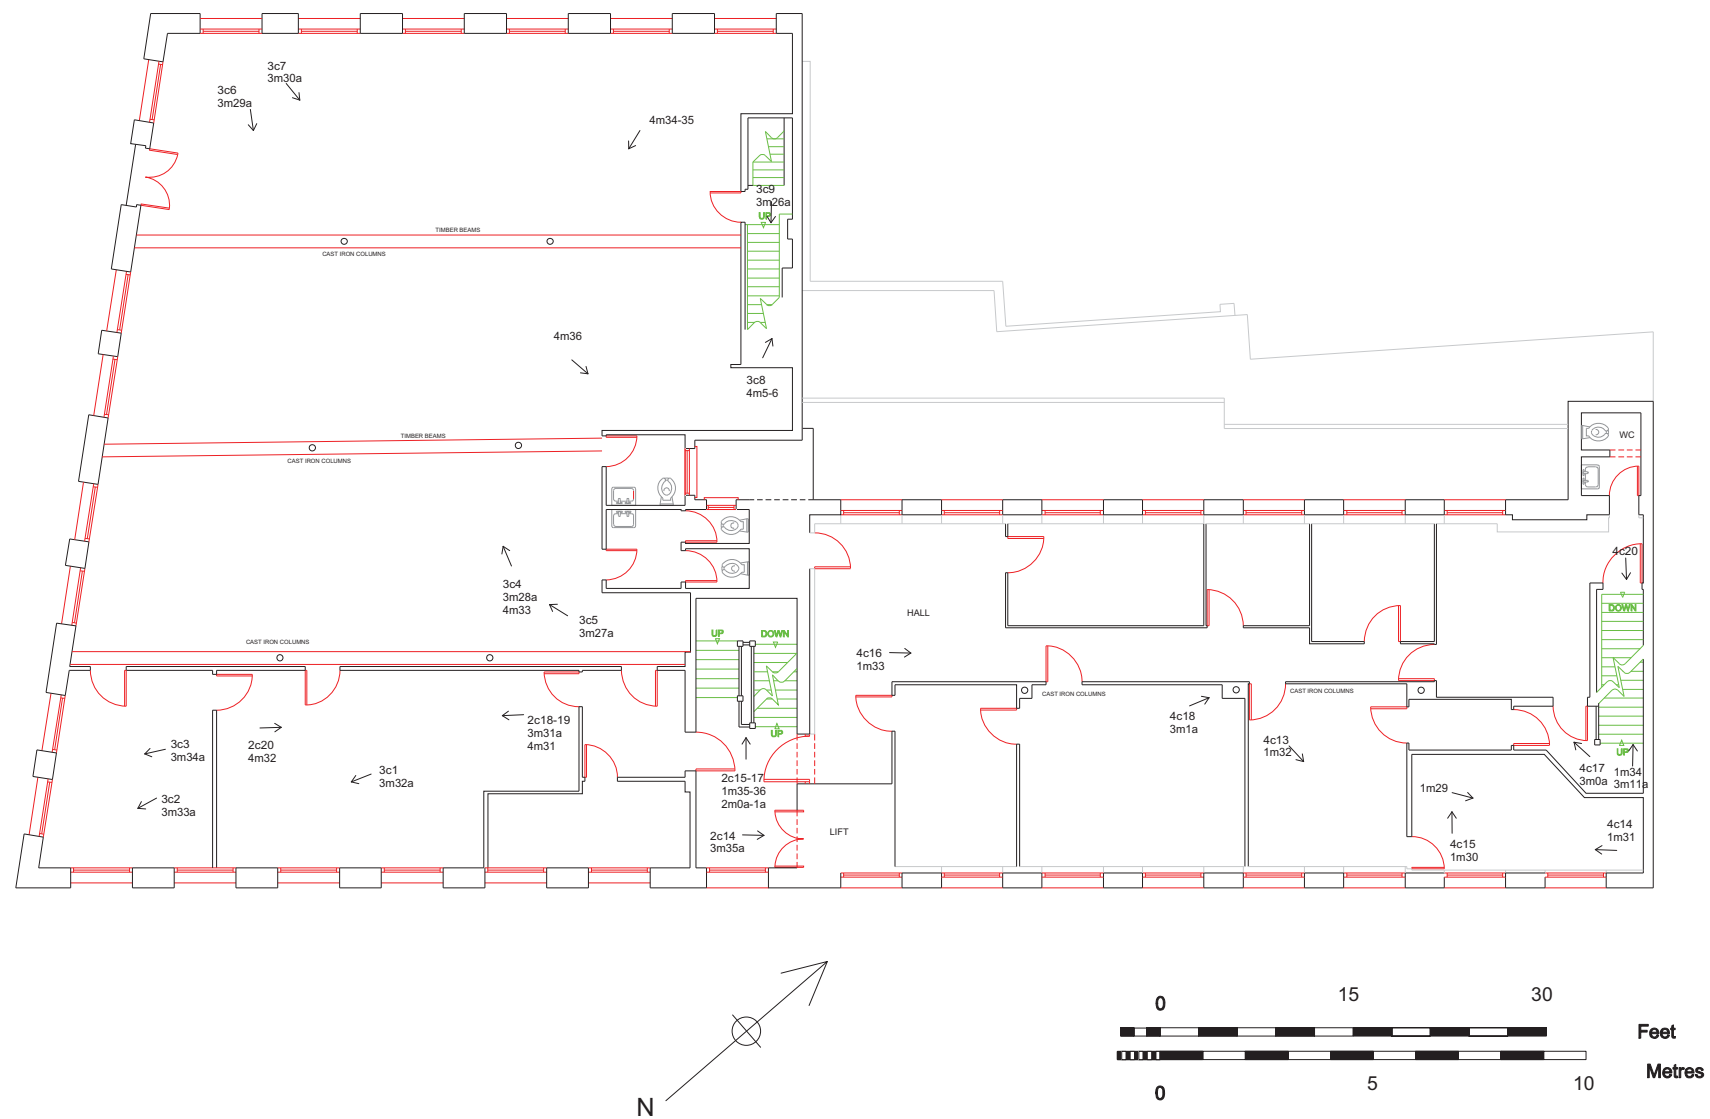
25-27 Bede Street First Floor Plan (based upon plans supplied by SV Surveyors Ltd)
